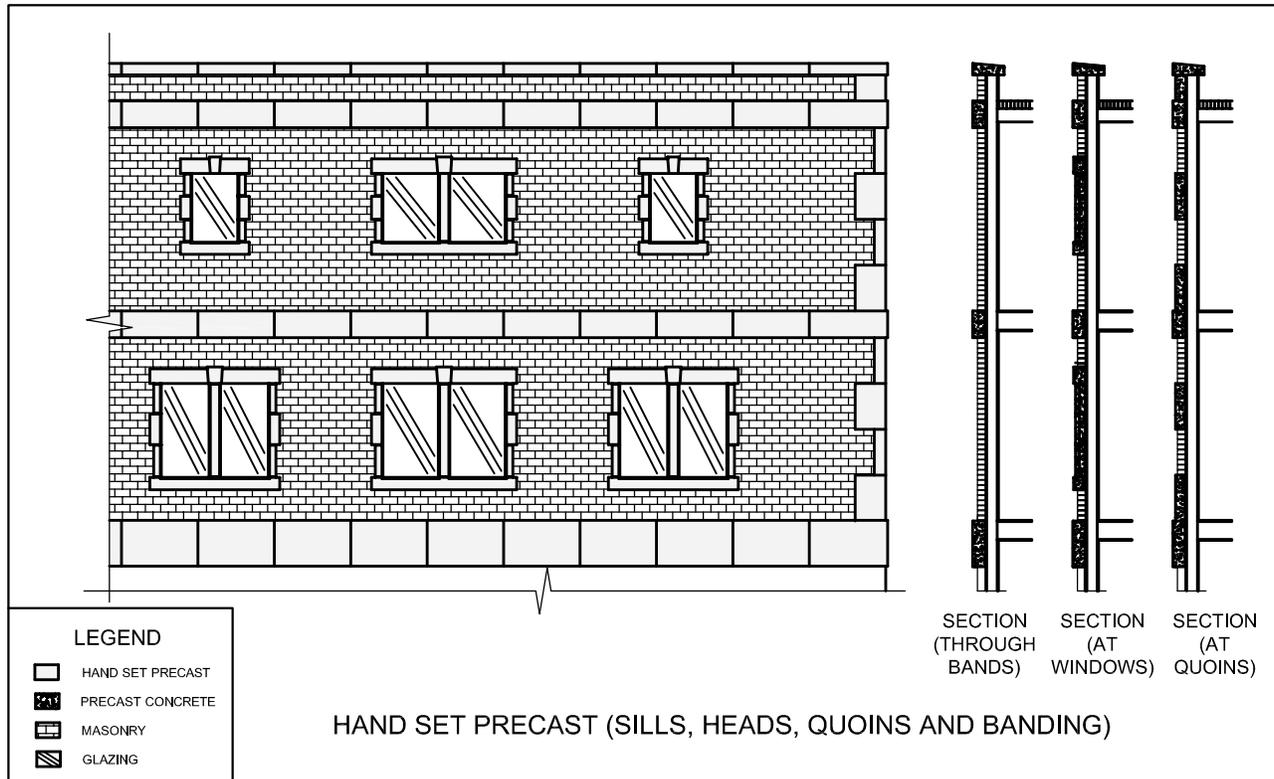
Hand Set Precast. Source: M. E. Hachborn Engineering
